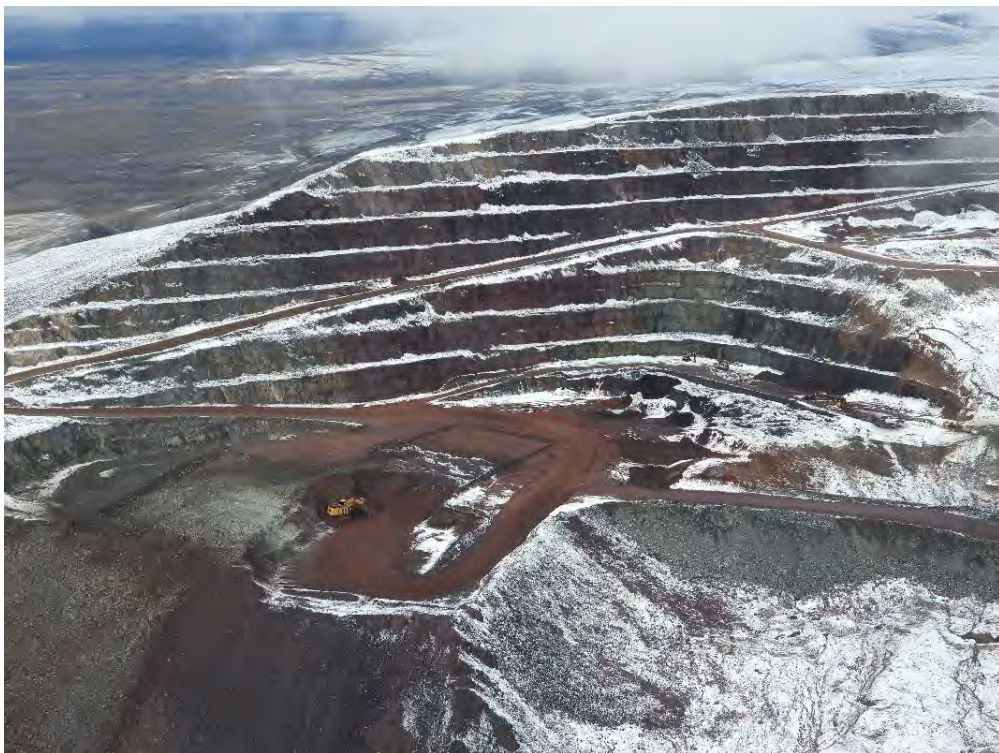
Aerial View of 480 Hill Side Road Construction – September 2023
